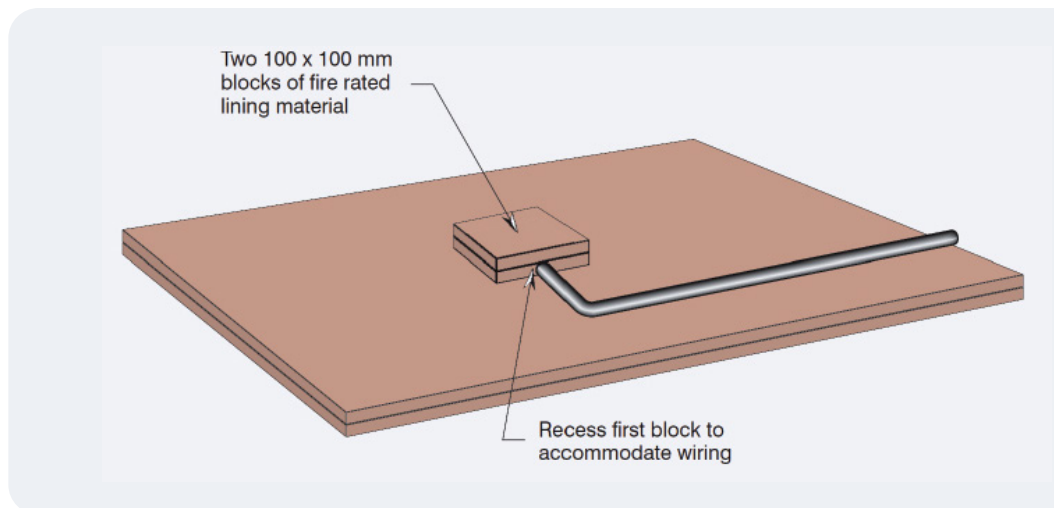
Recess block protection system for lighting cables penetrating fire-protected timber floors.
